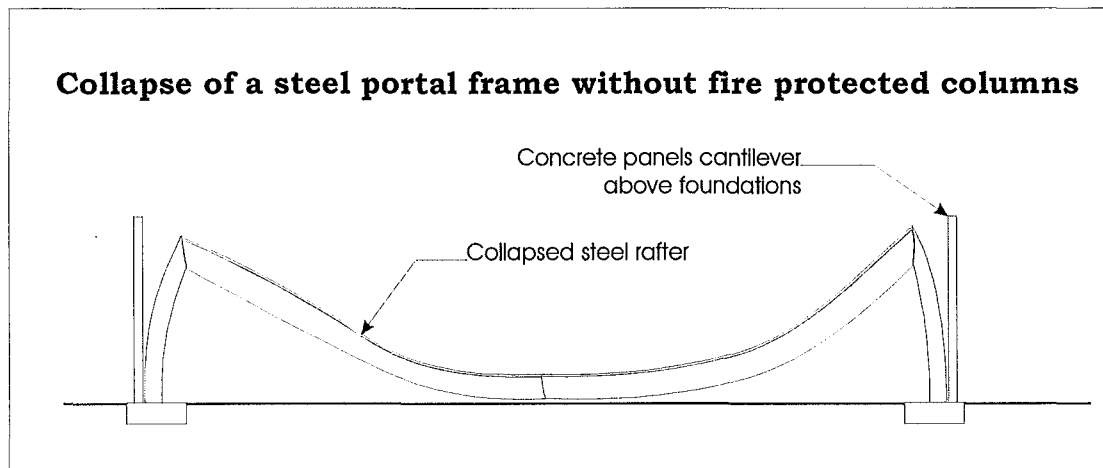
Collapse of a steel portal frame without fire protected columns.
